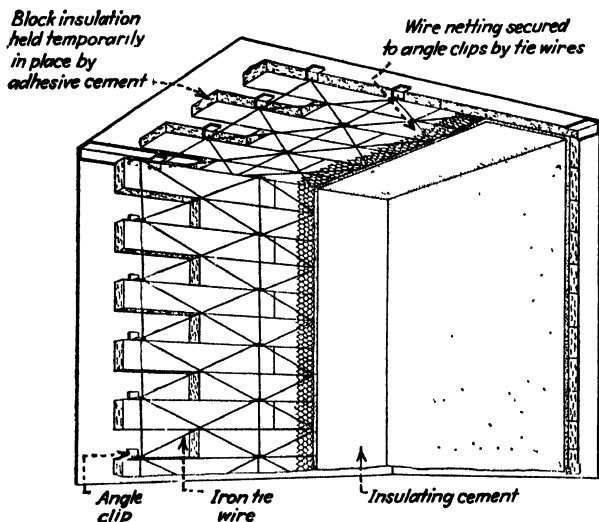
Method of wiring block insulation to flat metal surfaces. (Courtesy of the Johns-Manville Co.)
